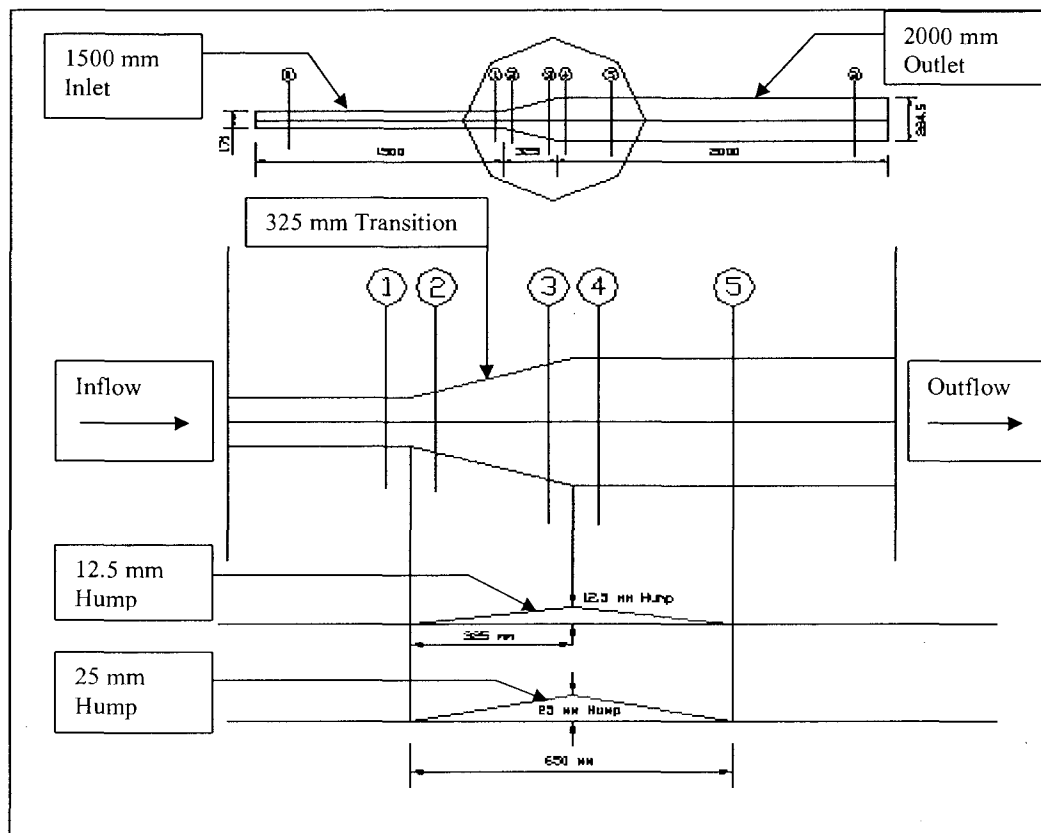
Plan of horizontal rectangular open channel transition fitted with humps
